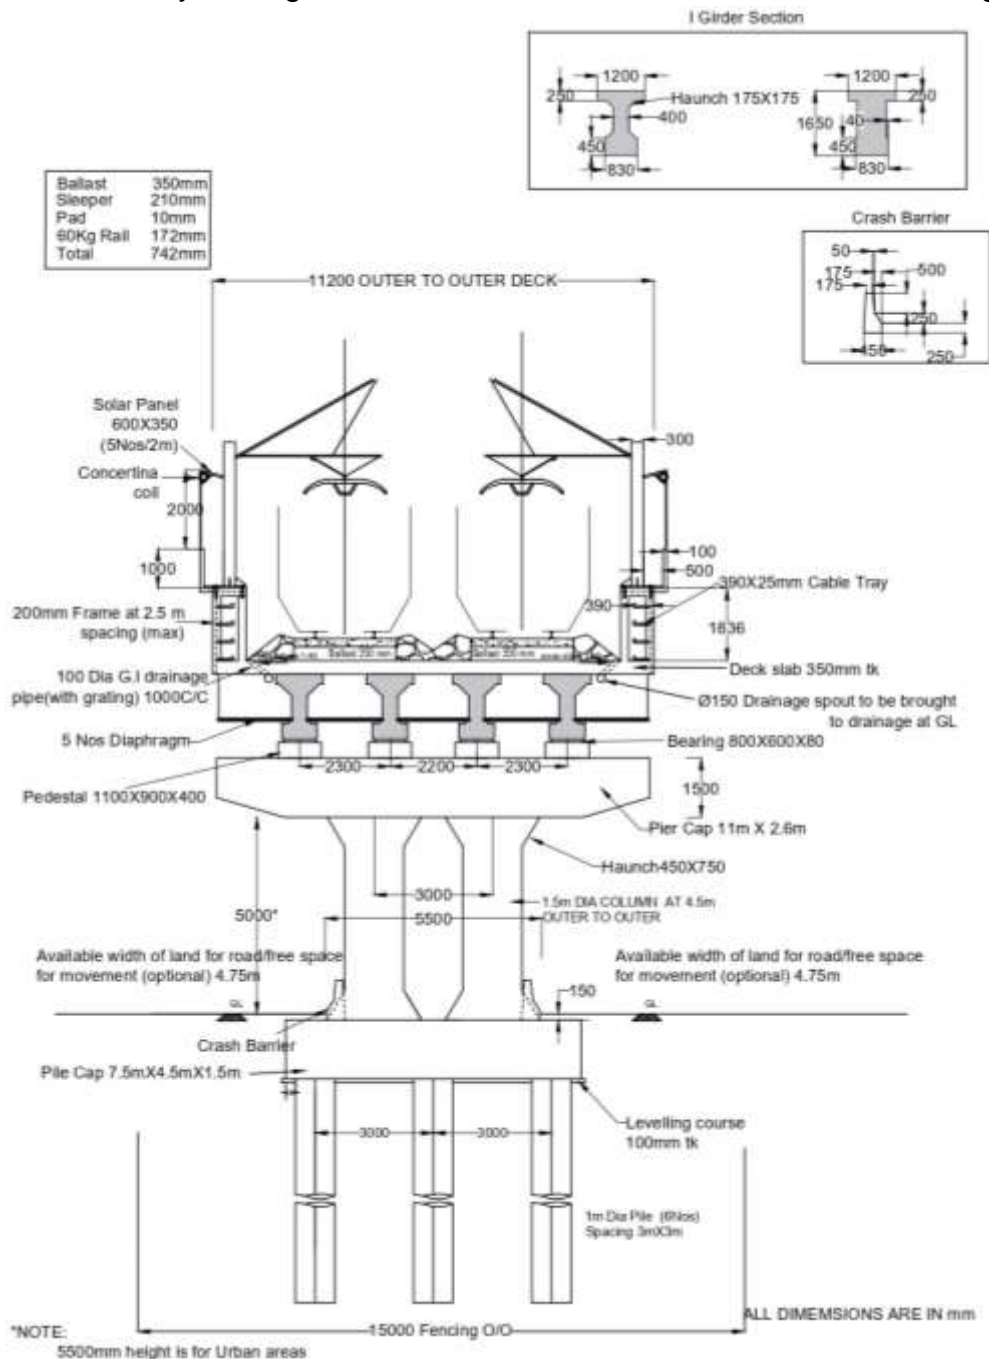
General Arrangement of Viaduct where OHE mast is on Girder
